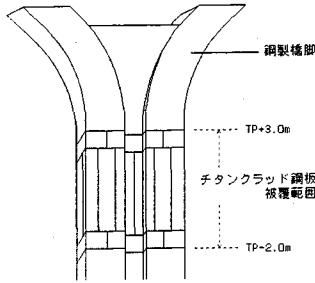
Illustration of mounting image of titanium clad steel sheet to steel piers of bridge.
